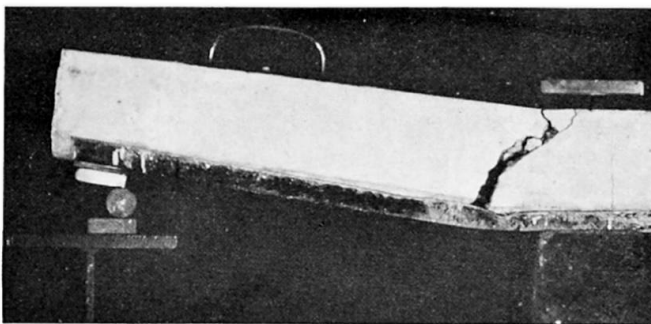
Typical shear-bond failure with end-slip of beam constructed with steel deck G
